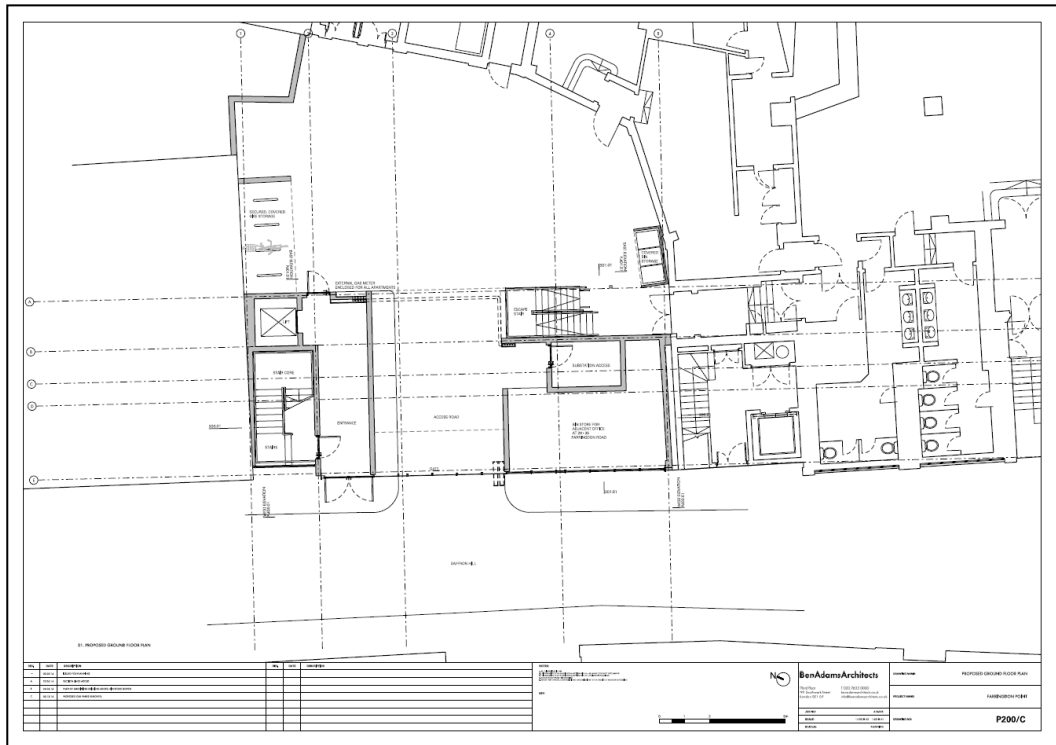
Proposed Ground Plan (©Ben Adams Architects)
